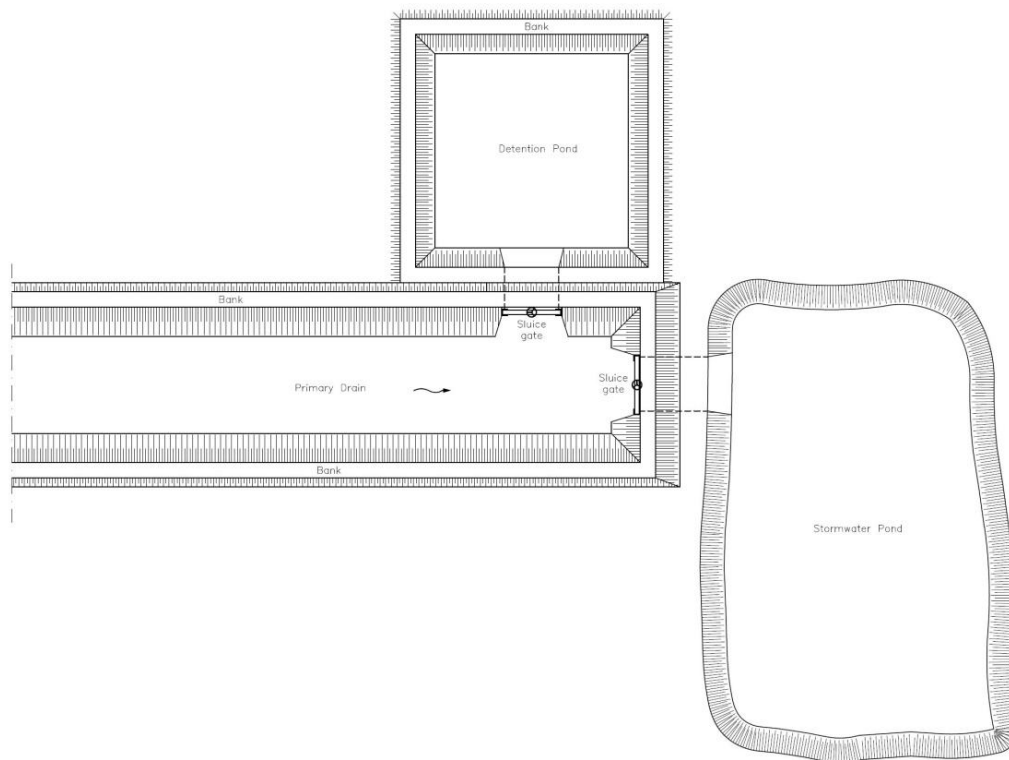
Planimetric view of terminal portion of a primary drain and connection with detention and storm water ponds
